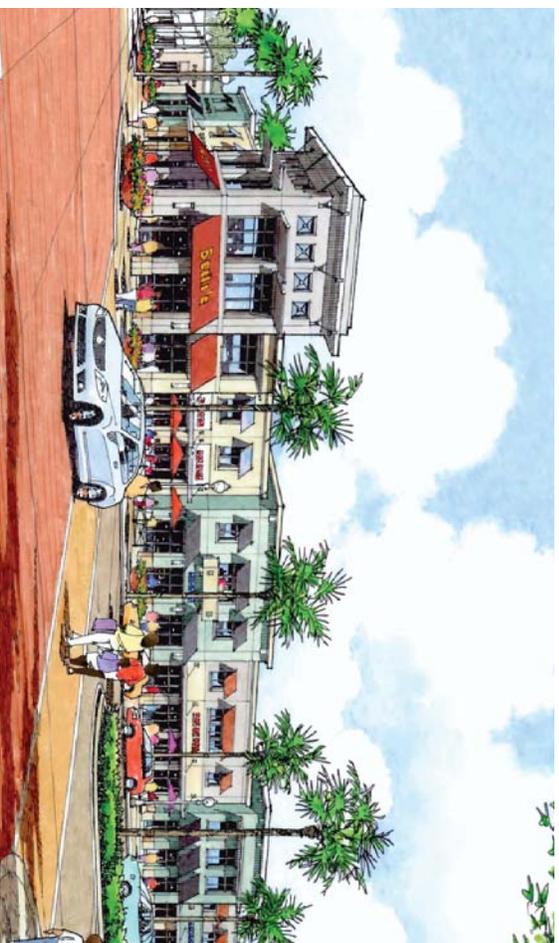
View of Proposed Blanch Ely Retail Stores (rendering by Dorsky Yue Architects)
